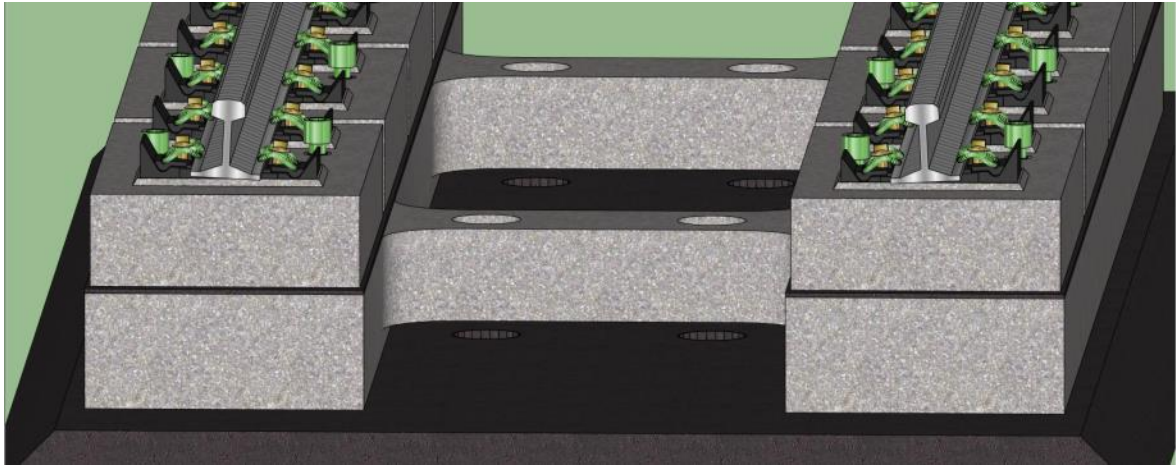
RELEASING OF FASTENERS AND FALSE SLEEPER DISASSEMBLY
